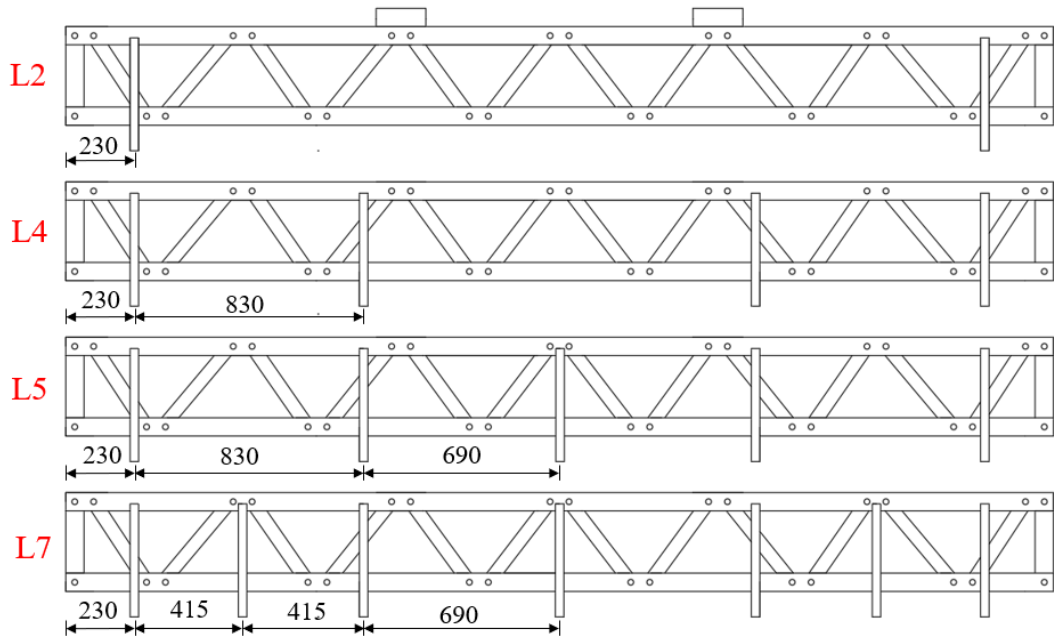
Layouts of lateral supports on trusses (all dimensions in mm)
